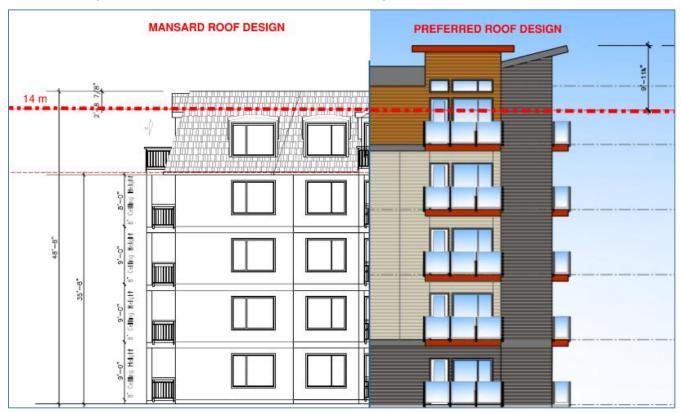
Two buildings are shown with 5 floors. On the left is a 4.5-storey building with 8' ceilings that requires greater than the maximum 14-metre building height of the CD6 zone to be constructed, as shown. On the right is a 5-storey building with 9' ceilings that requires an increase in building height to be constructed, as shown.
